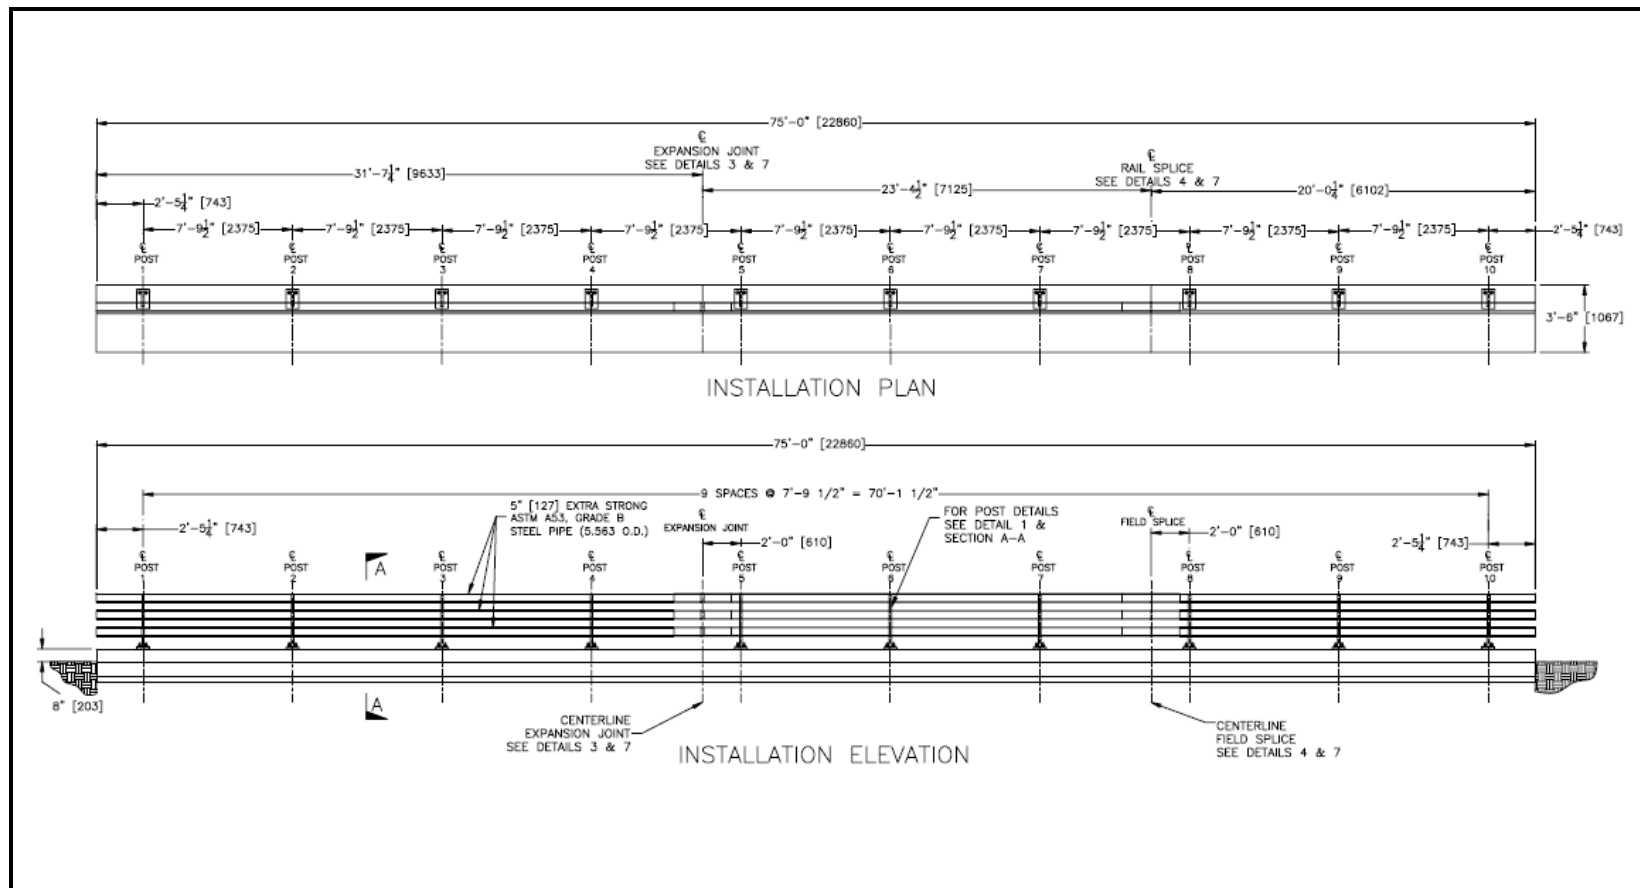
Layout of George Washington Memorial Parkway Bridge Rail
